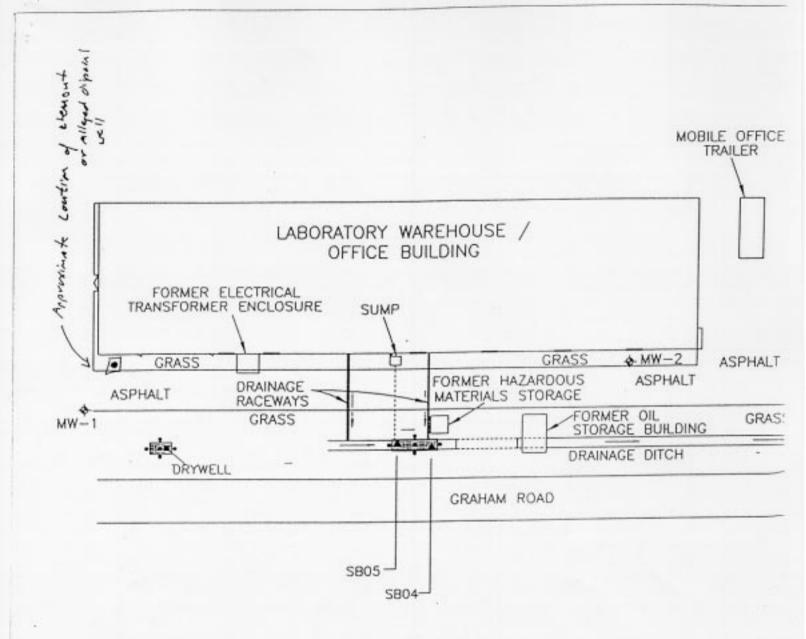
SITE PLAN NORTH PACIFIC DIVISION LABORATORY, TROUTDALE, OREGON TETRA TECH INC.
